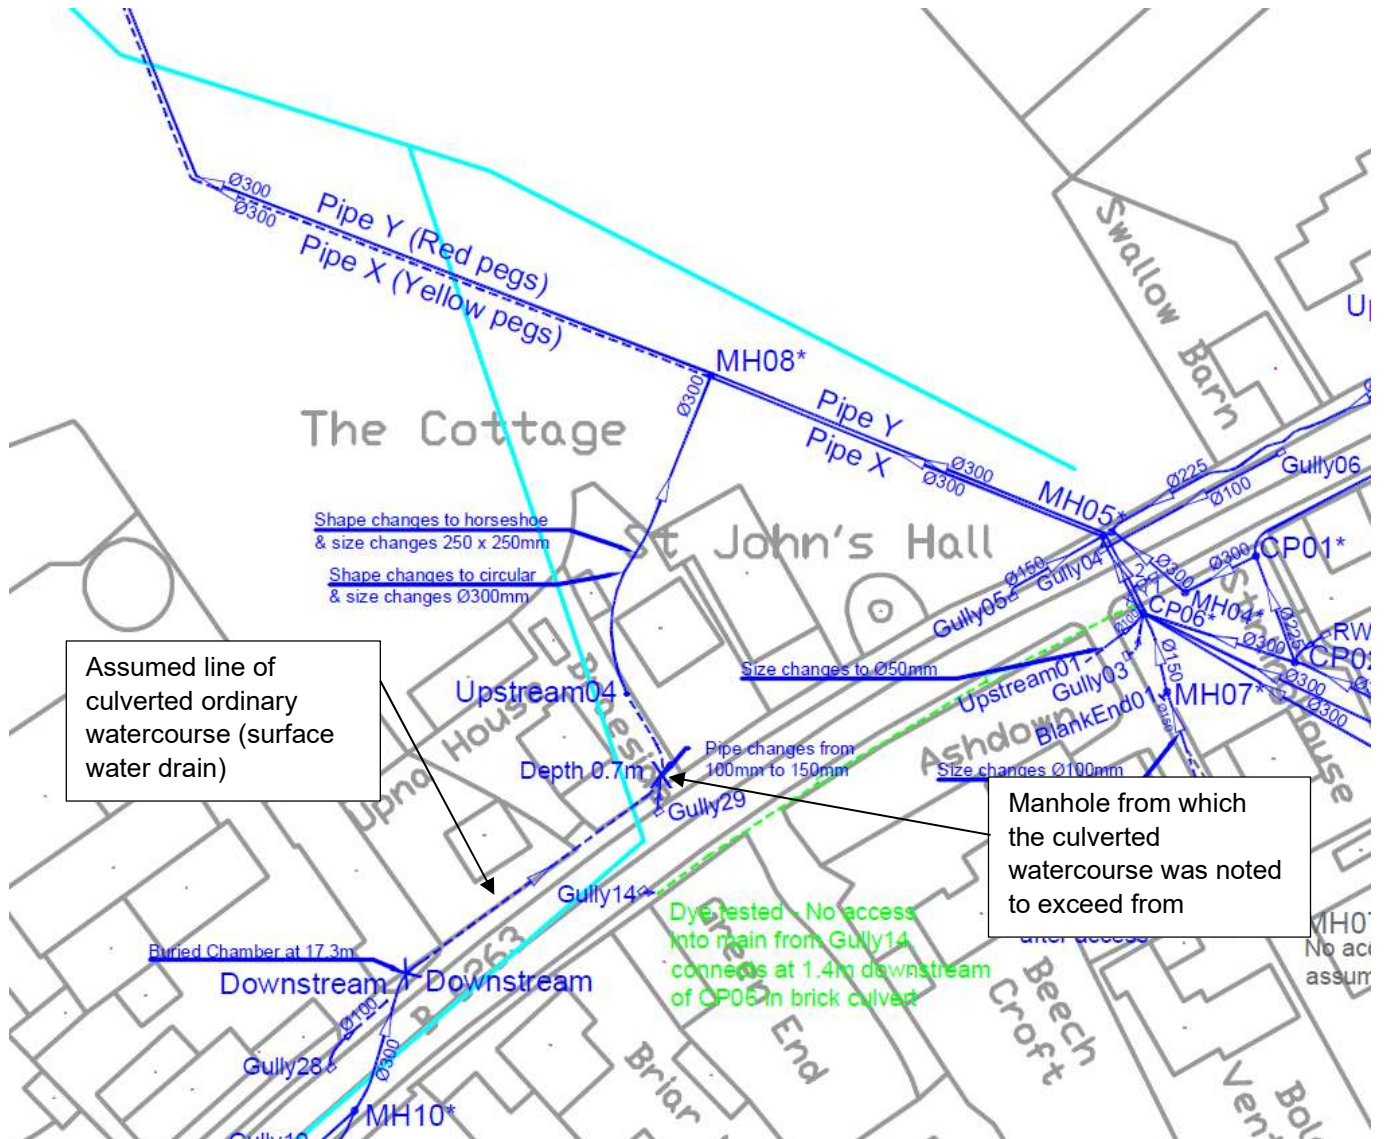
Snapshot of CCTV survey of drainage network undertaken in 2020. The culvert exceeded from a manhole in a private driveway (adjacent to Gully 29).
